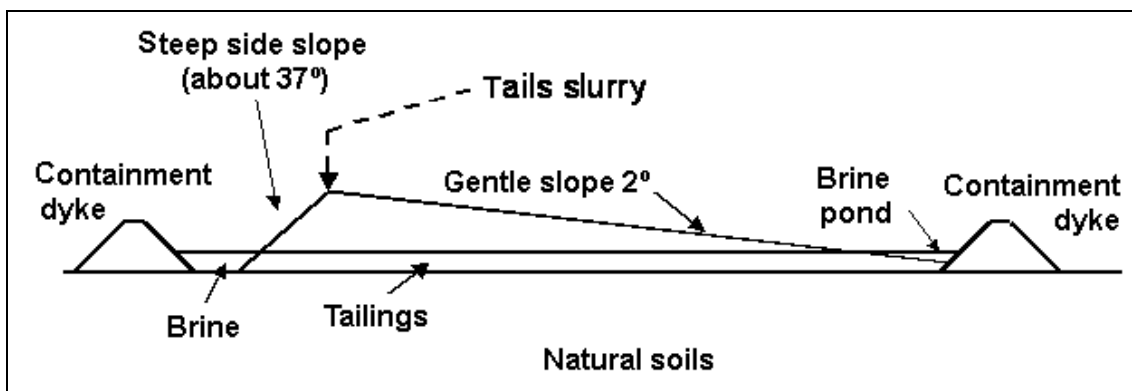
Typical cross-section of Canadian tails piles (schematic)
